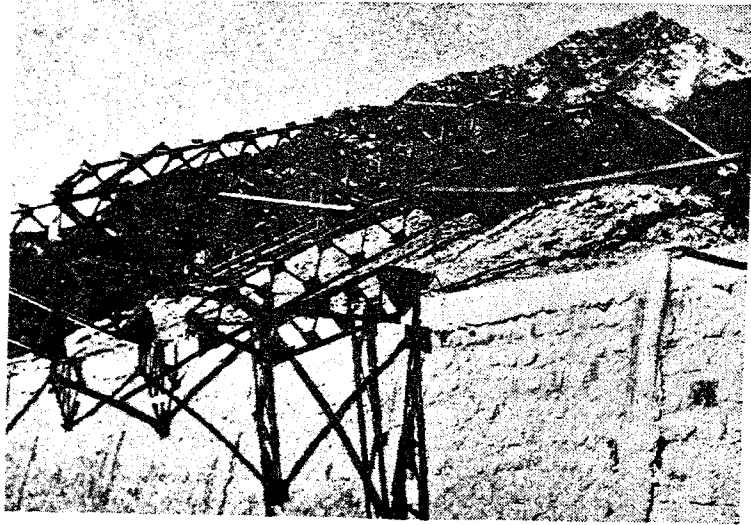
Steel structure at El Volcan. The galvanized sheet cover has been withdrawn.
